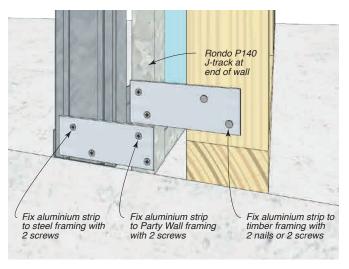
Junction Of Party Wall And Non-Fire Rated Internal Steel Framed Wall – Alternative Method – Plan View
